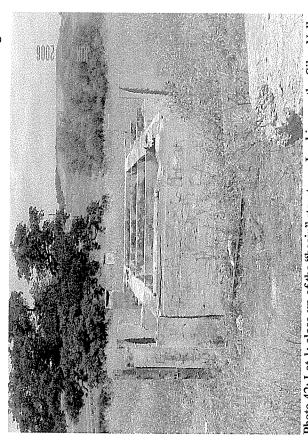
Lot 1; close-up of the "basin" structure. Looking north. Silva Valley Parkway can be seen on the left.
